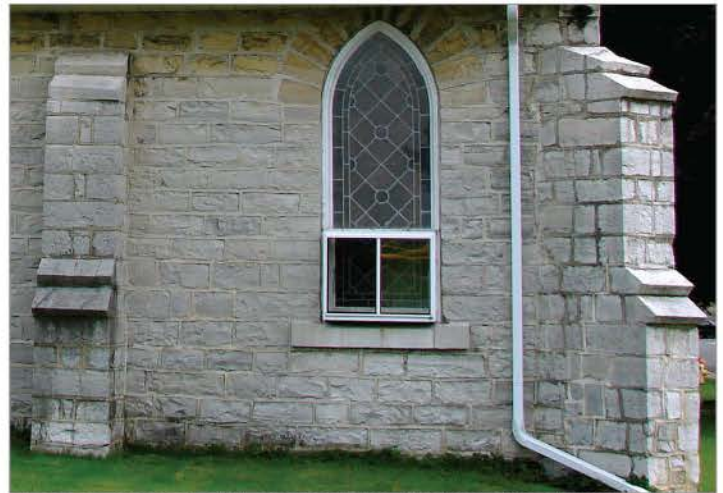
ST. JOHN'S, PORTSMOUTH, DETAIL OF STONEMWORK OF WALLS AND BUTTRESSES ON THE NORTH FAÇADE. | PAUL CHRISTIANSON, 2011.
